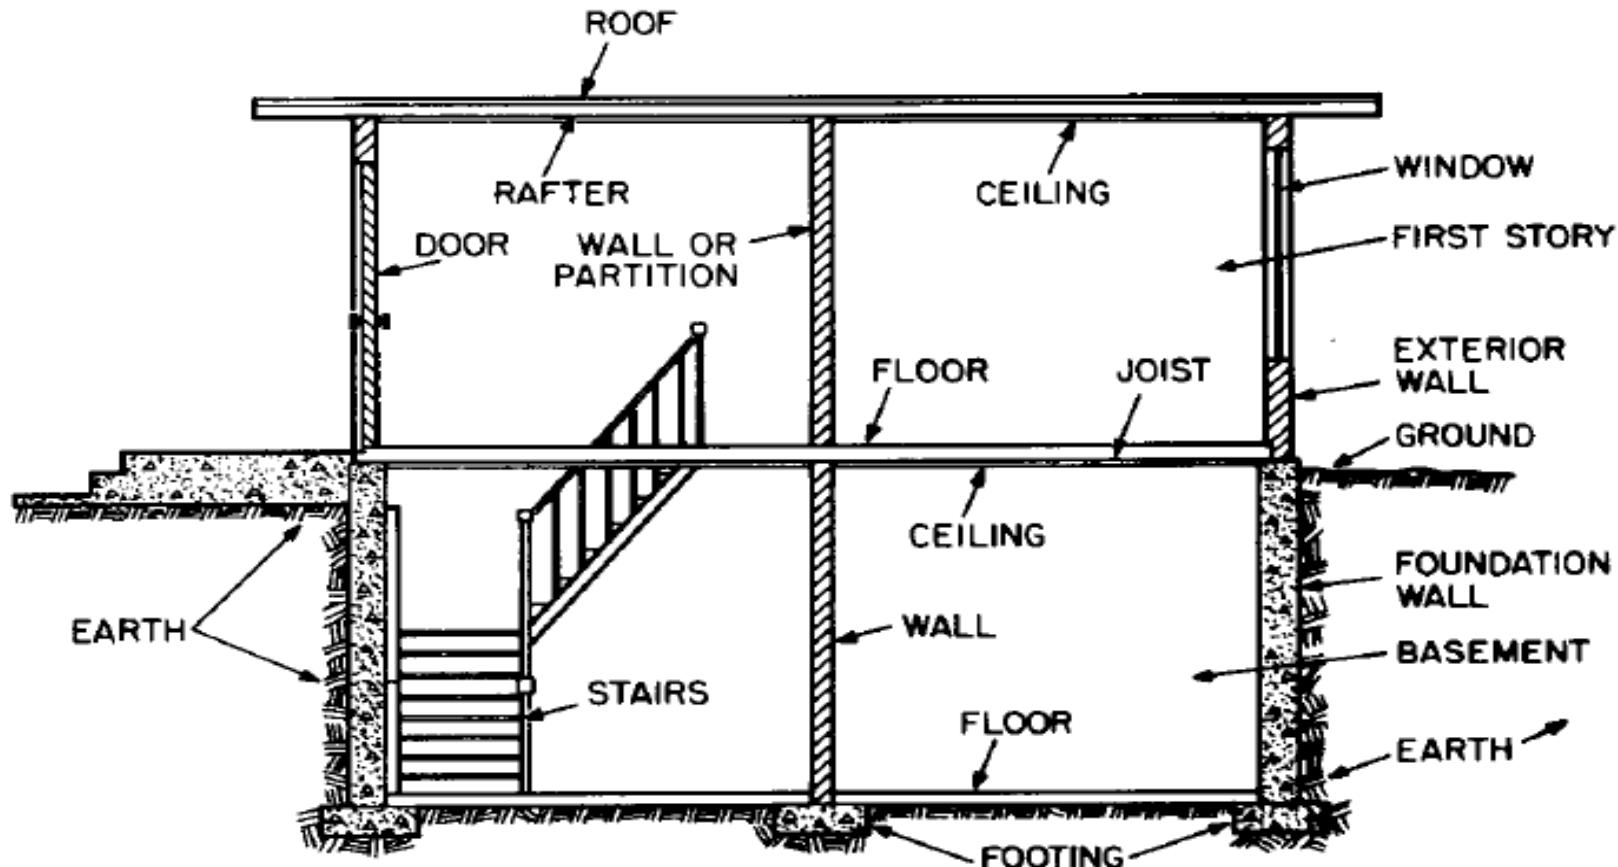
Vertical section through a one-story building with basement shows location of some major components. (Reprinted with permission from F. S. Merritt and J. Ambrose, "Building Engineering and Systems Design," 2d ed., Van Nostrand Reinhold, New York.)
